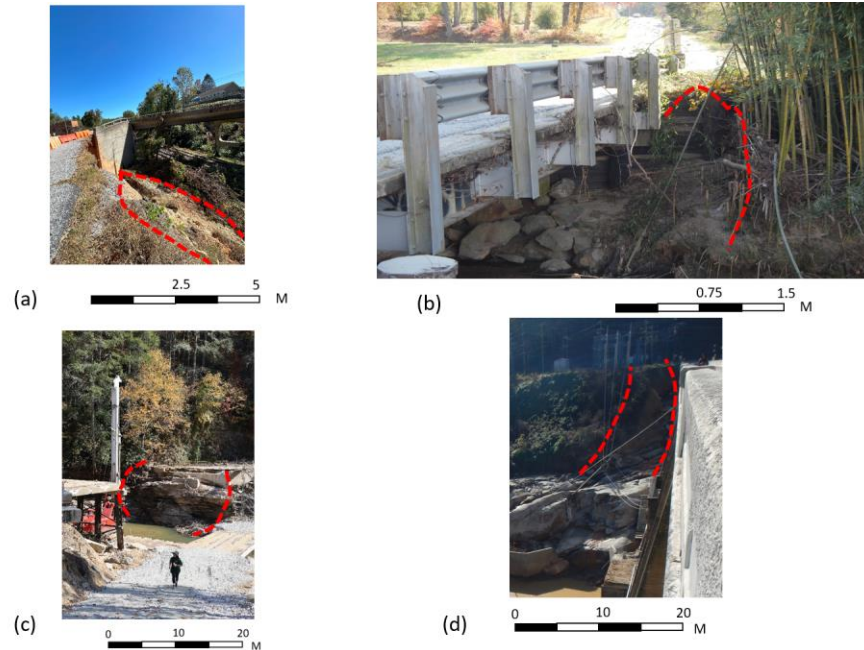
Hurricane Helene landslides damages to bridge structures: a) Main Street bridge over railroad, Saluda, NC; b) bridge near Lake Lure; c) ; d) Dam crossing, Lake Lure. (Photo credit: Shen-En Chen, Sophia Lin, and Qifan Zhao)
